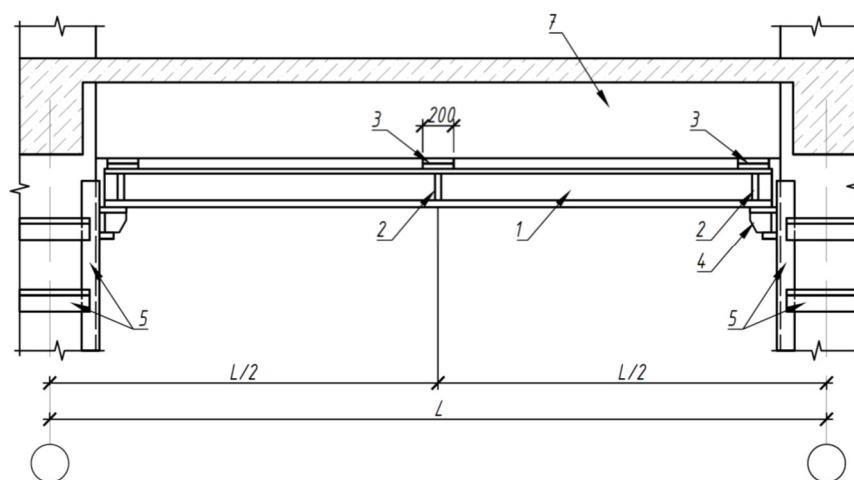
Strengthening of the reinforced concrete beam with the steel beam resting on the piers
